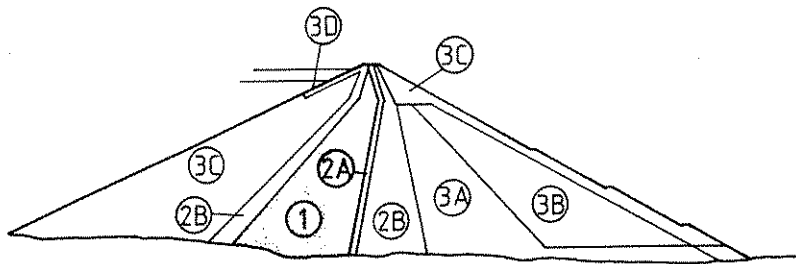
Talbingo rockfill dam with inclined earth core (adapted from Wallace & Hilton 1972).
